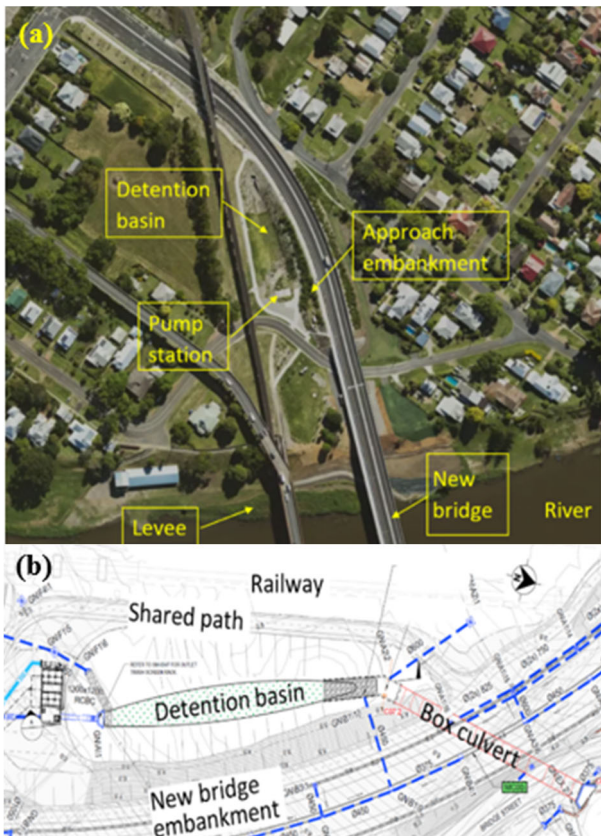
(a) Site setting showing the detention basin, the new bridge and the river and (b) general arrangement of detention basin, box culvert and new bridge embankment area.
